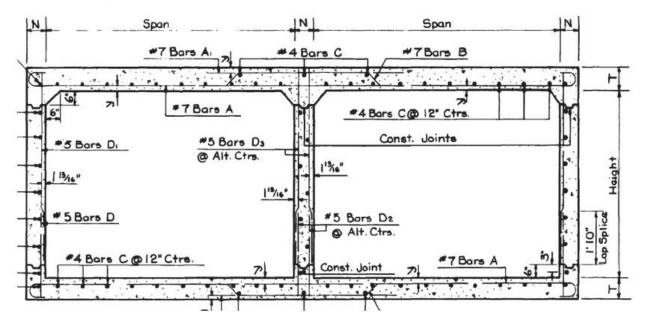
LADOTD standard reinforcement details of double-cell RC box culvert in Louisiana DOTD
